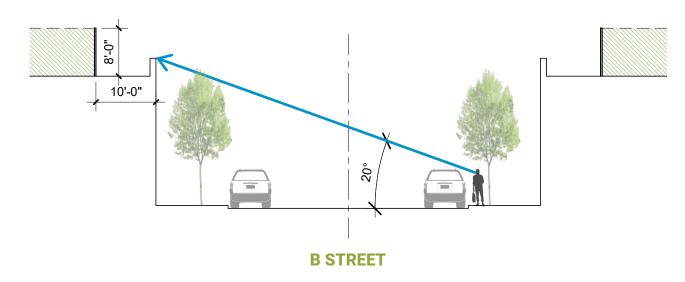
ROOFTOP EQUIPMENT ZONE B
